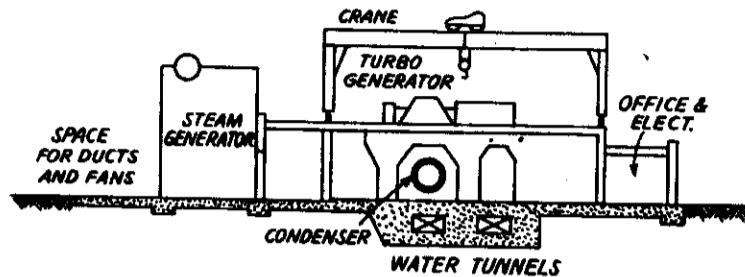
Building arrangement for an out-door type steam electric station.
